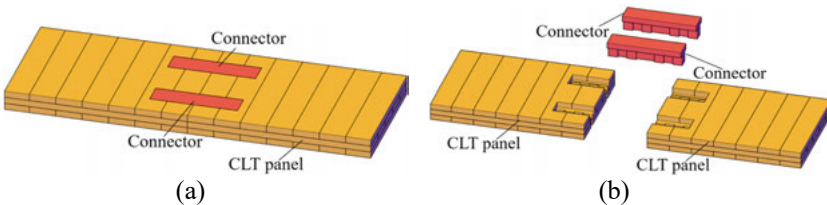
CLT panels with TS connection, (a) jointed view and (b) installation illustration.
